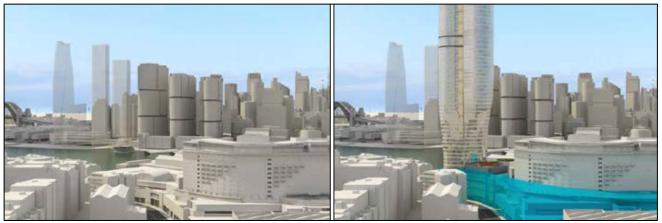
| Existing (left) and proposed (right) easterly views from the living room of an apartment on level 15 (note blue shading indicates LEP compliant envelope) (Source: Proponent's EA)
